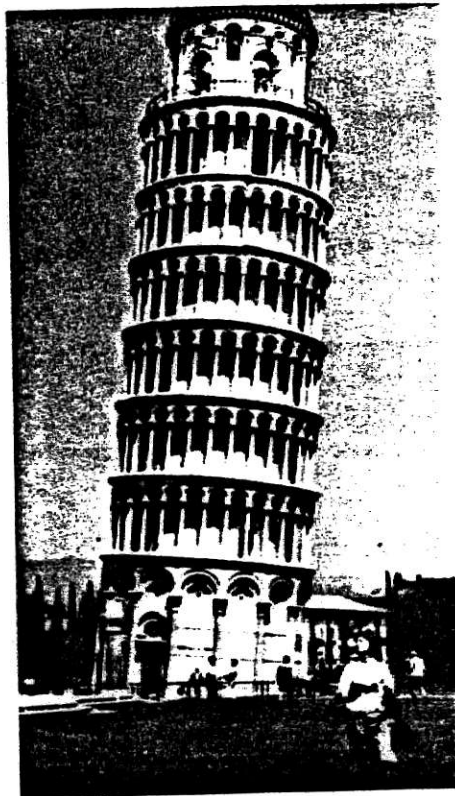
Pisa Tower. The most successful foundation failure.
